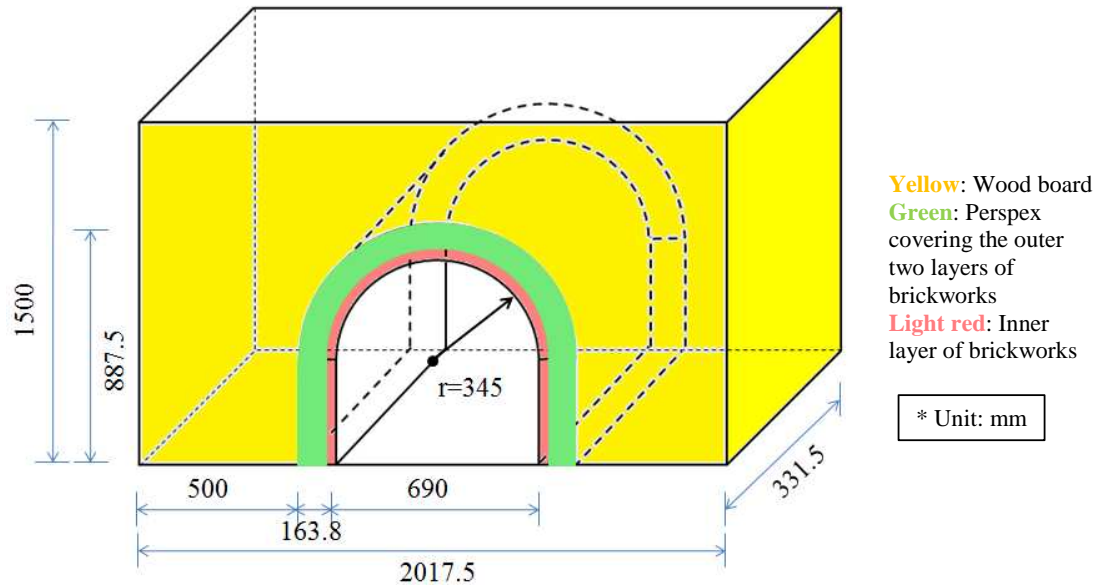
The rigid box surrounding the brick-lined tunnel
